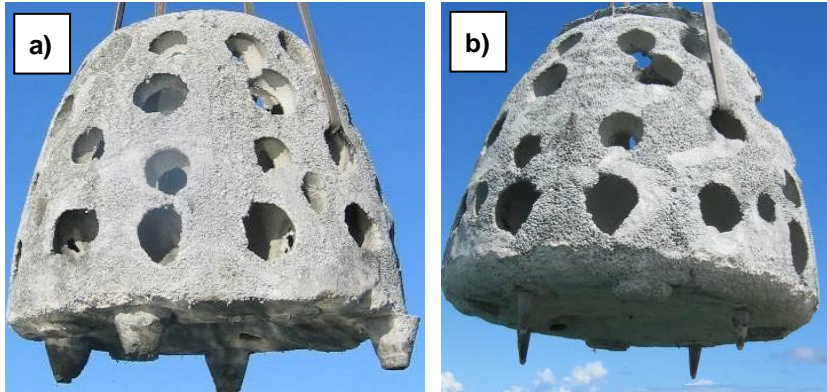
a). Anchoring cones; b) Anchoring spikes (Reef Ball Foundation, 2008).
